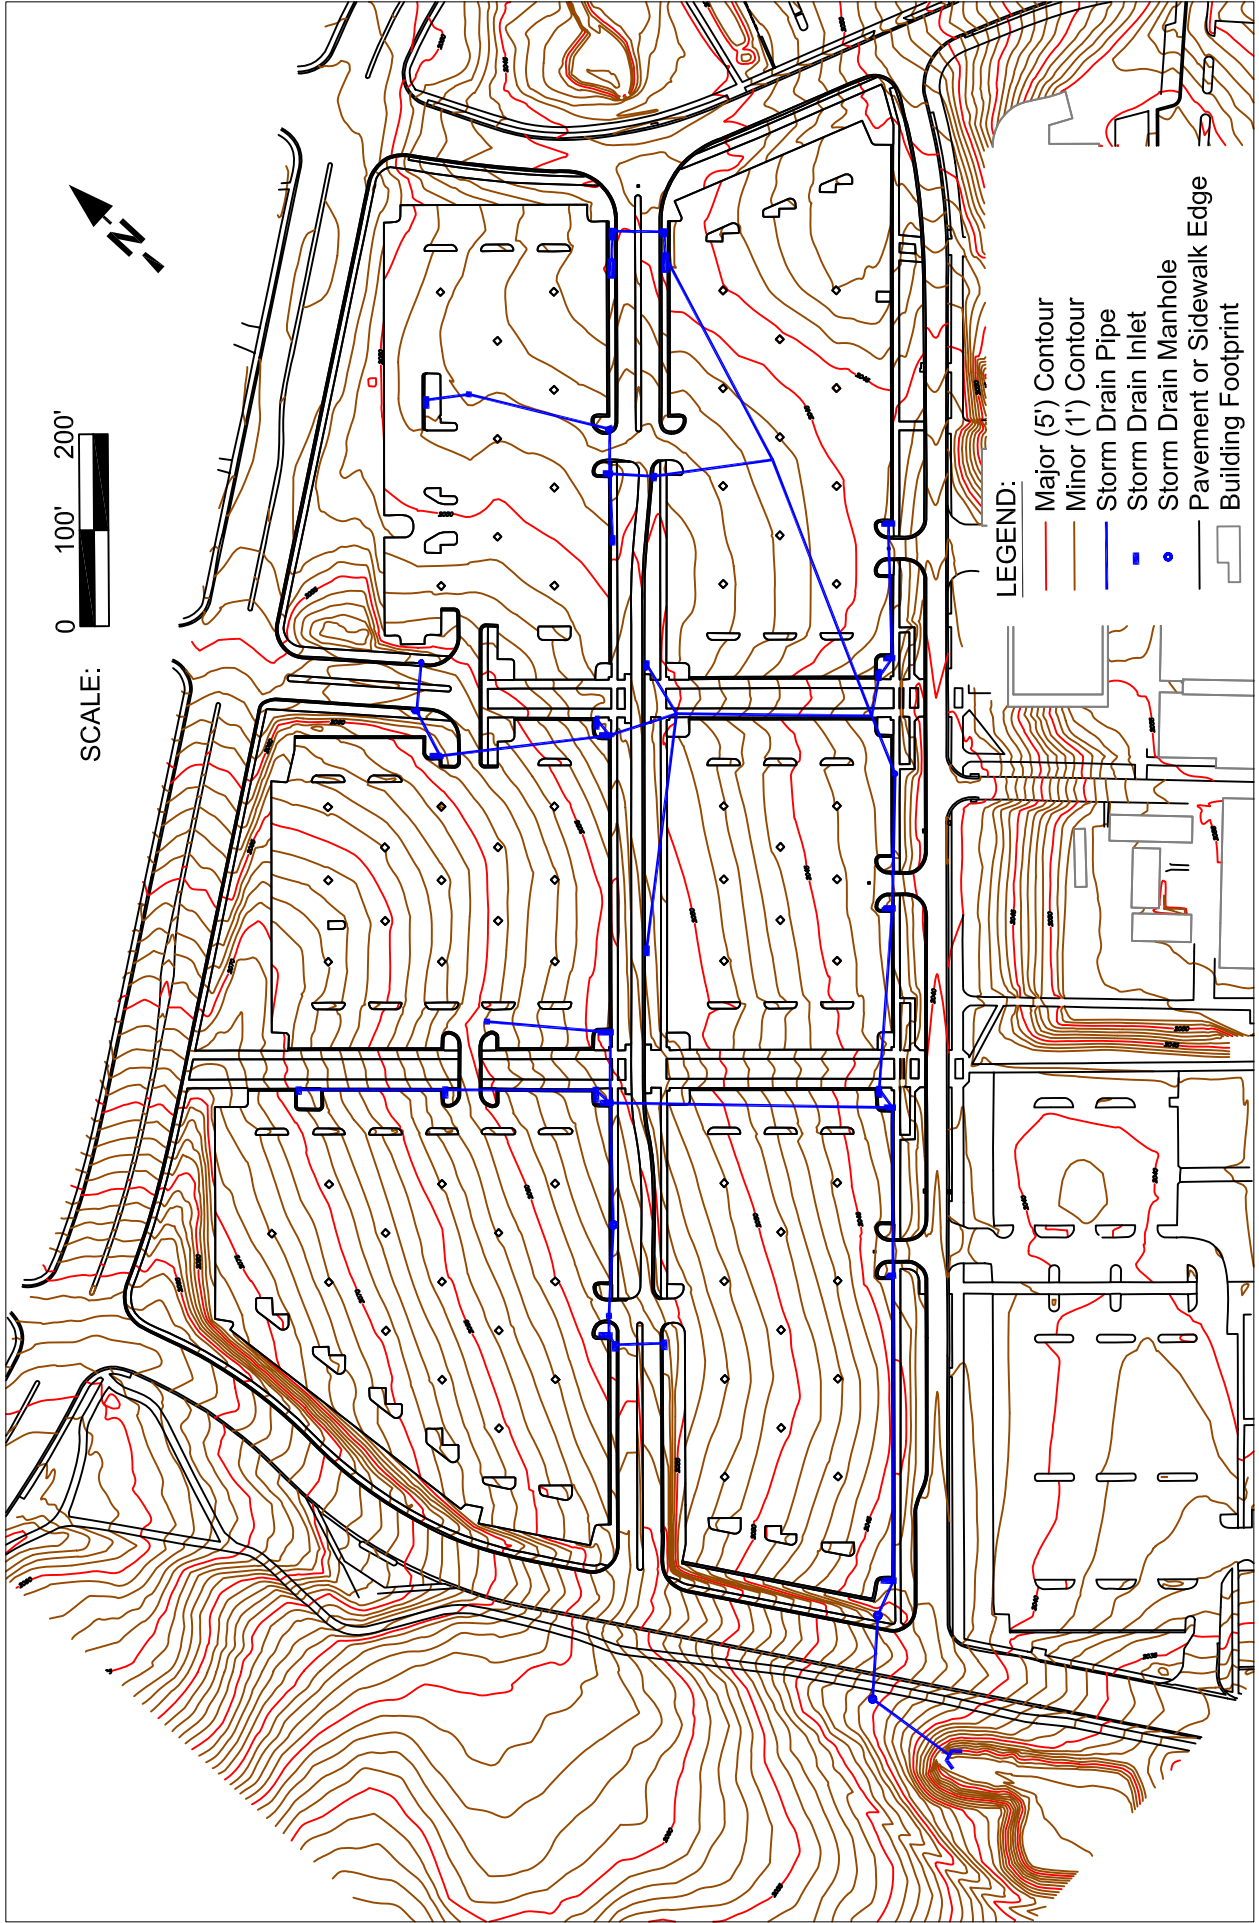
Virginia Tech Parking Lot Topography (Source: University Planning, Design, and Construction Services)
